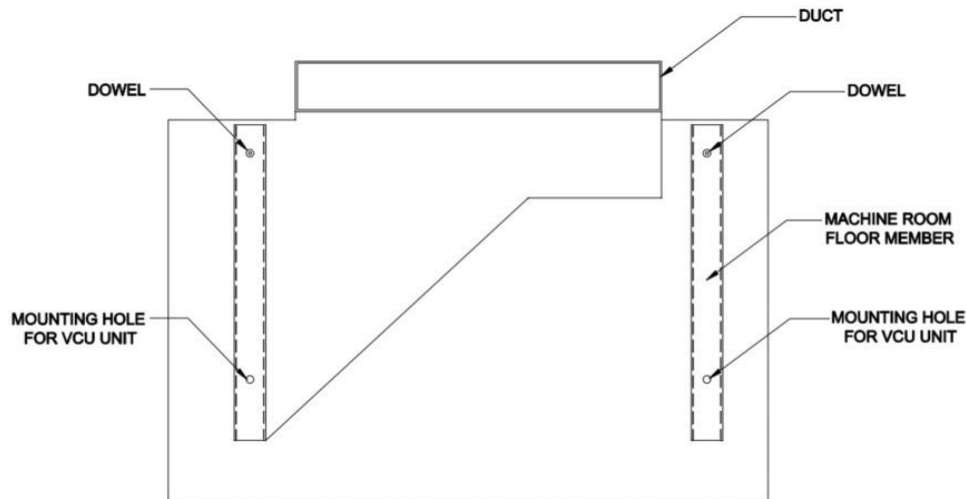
Mounting Surface for VCU on Machine Room Floor
